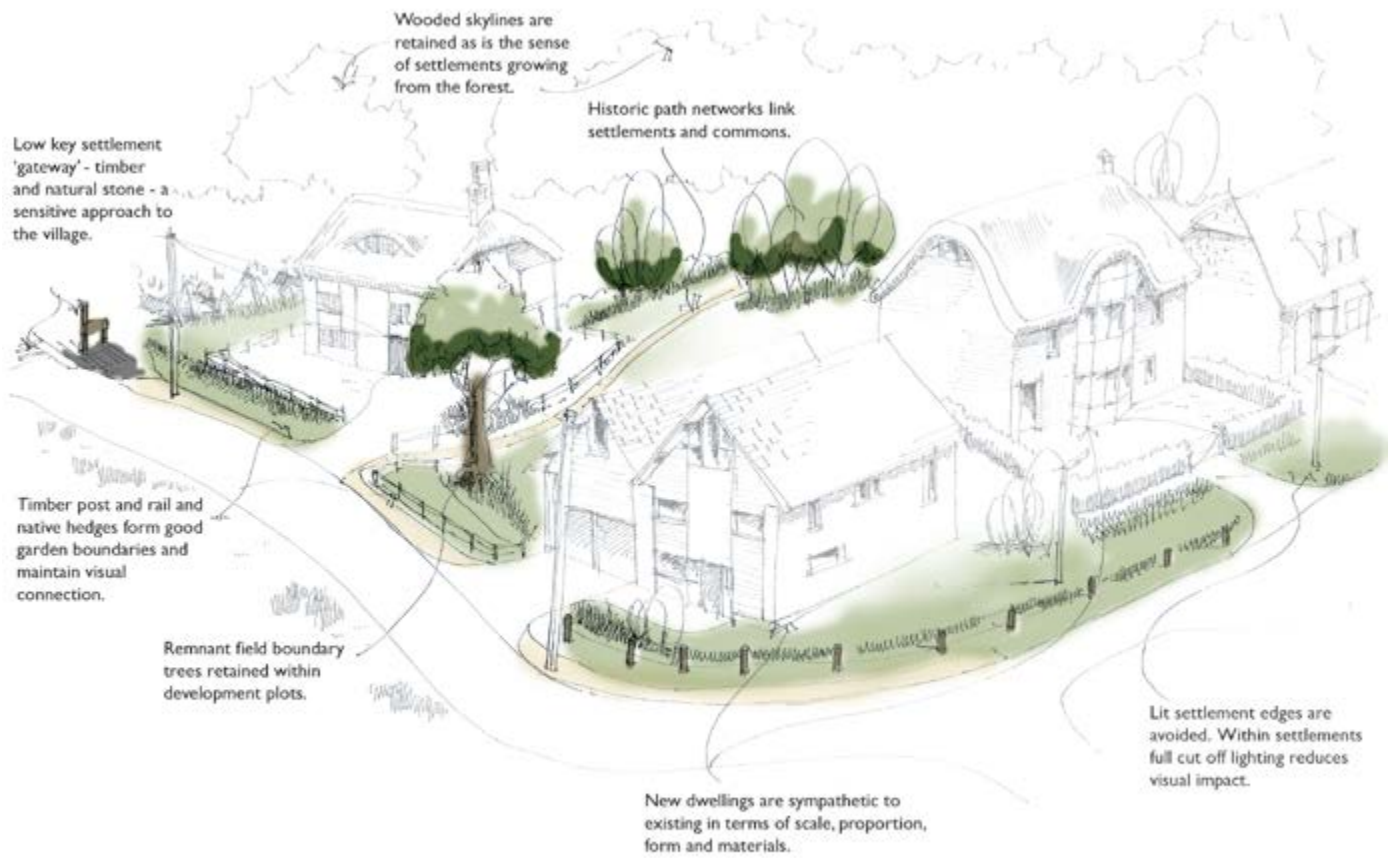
shows other suggested elements of site layout and design for new development on the settlement edge including:
